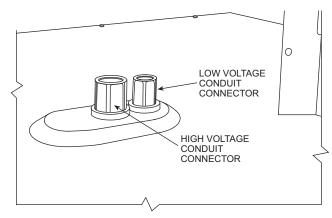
Thru-Base Connection Fittings (Size 120)
